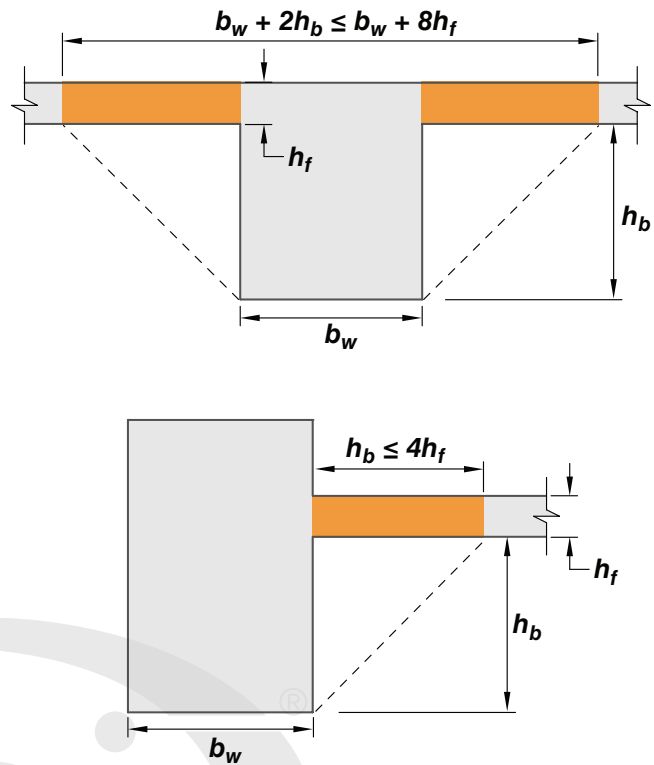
Examples of the portion of slab to be included with the beam under 8.4.1.8.
